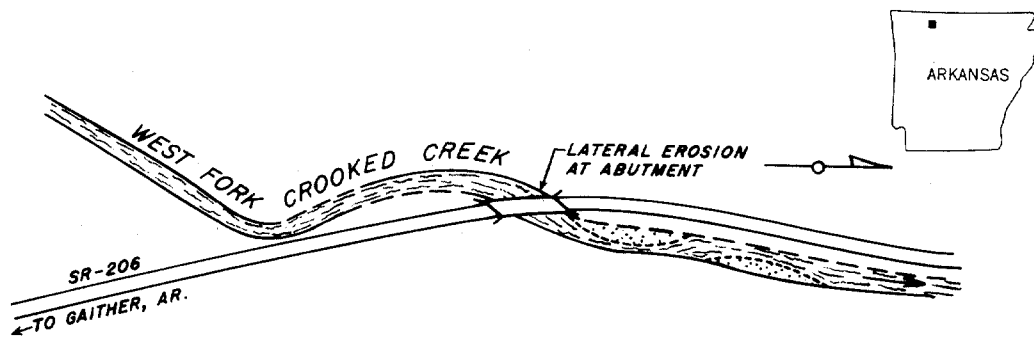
Plan sketch of west fork Crooked Creek at SR-206 crossing.
